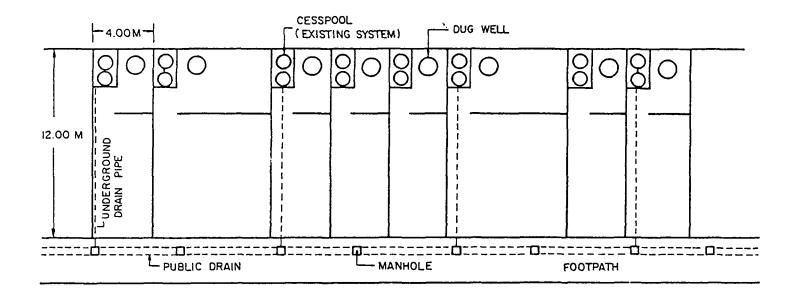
Typical Layout of Rowhouse with Drainage of Cesspool System Overflow to Public Drain
